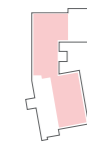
Trygghetsboende Bifrost ground floor plan (Scale - 1:500). Source: Drawing provided by the company
